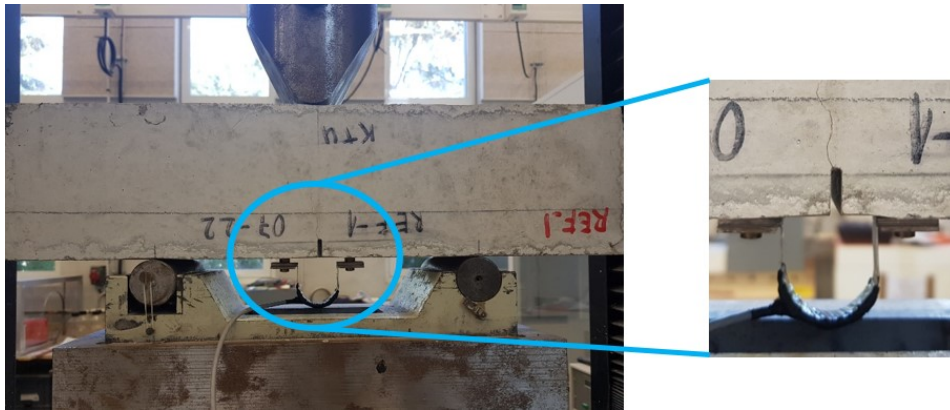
Three-point bending test (beam span = 210 mm) on a prismatic specimen with a crack opening sensor controlling the crack width.
